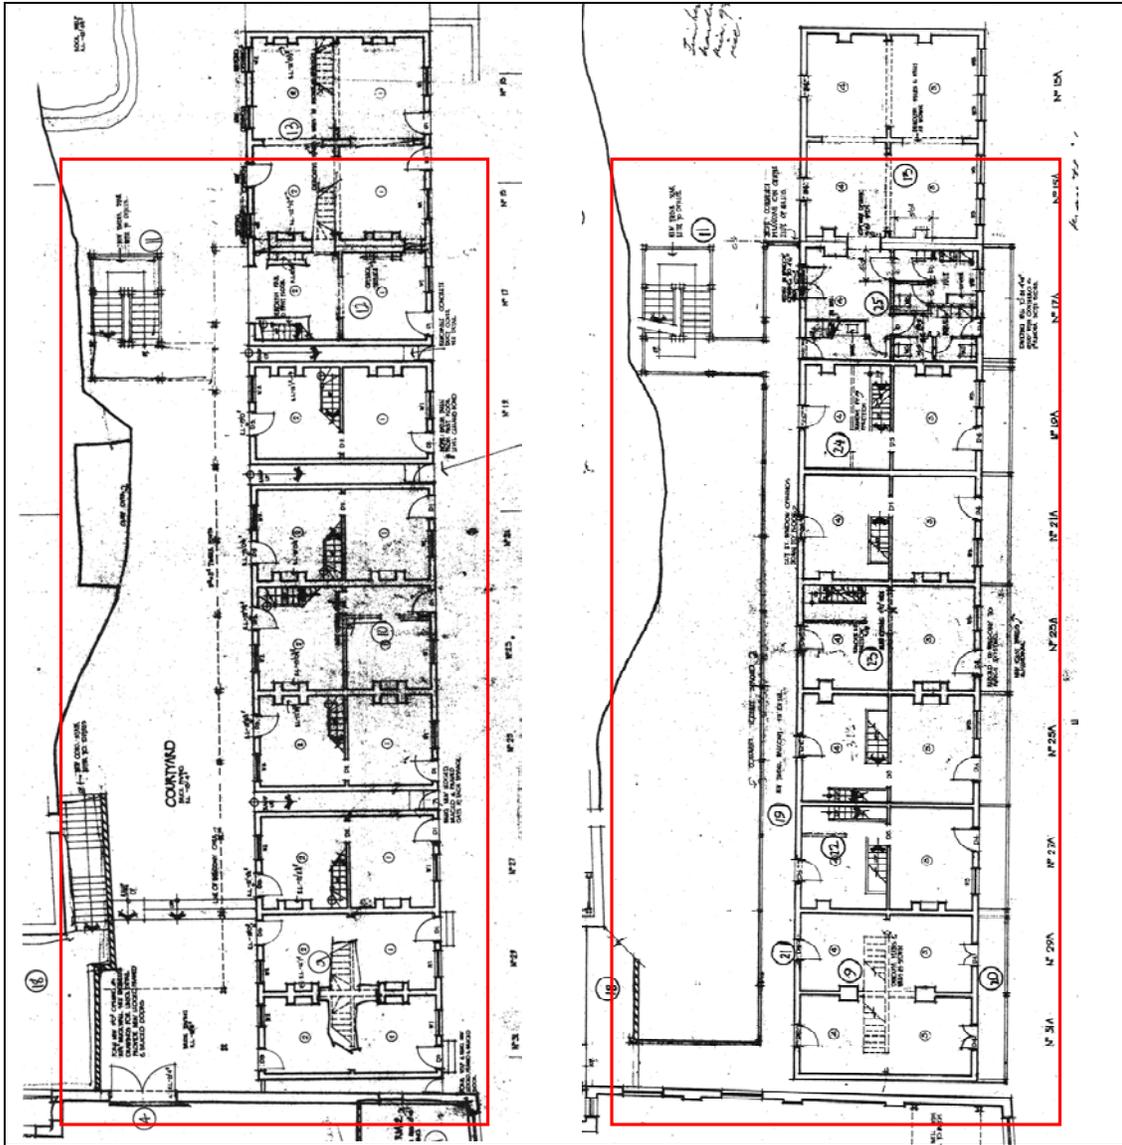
Amended floor plans prepared by Fisher Jackson Hudson Architects in 1972. Ground Floor above and First Floor (at right). (Source: City Archives 1383/71)
